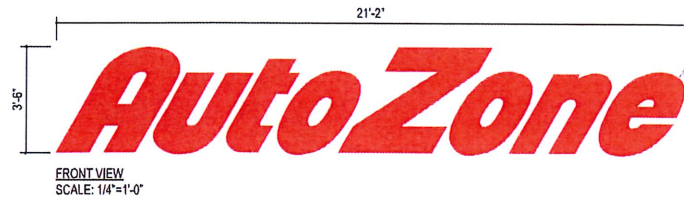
PROPOSED COLOR ELEVATIONS
